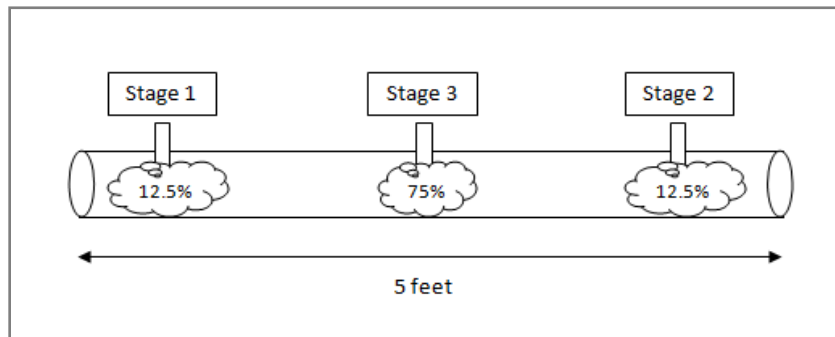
Typical stage injection of grout in a 5 feet long pipe
